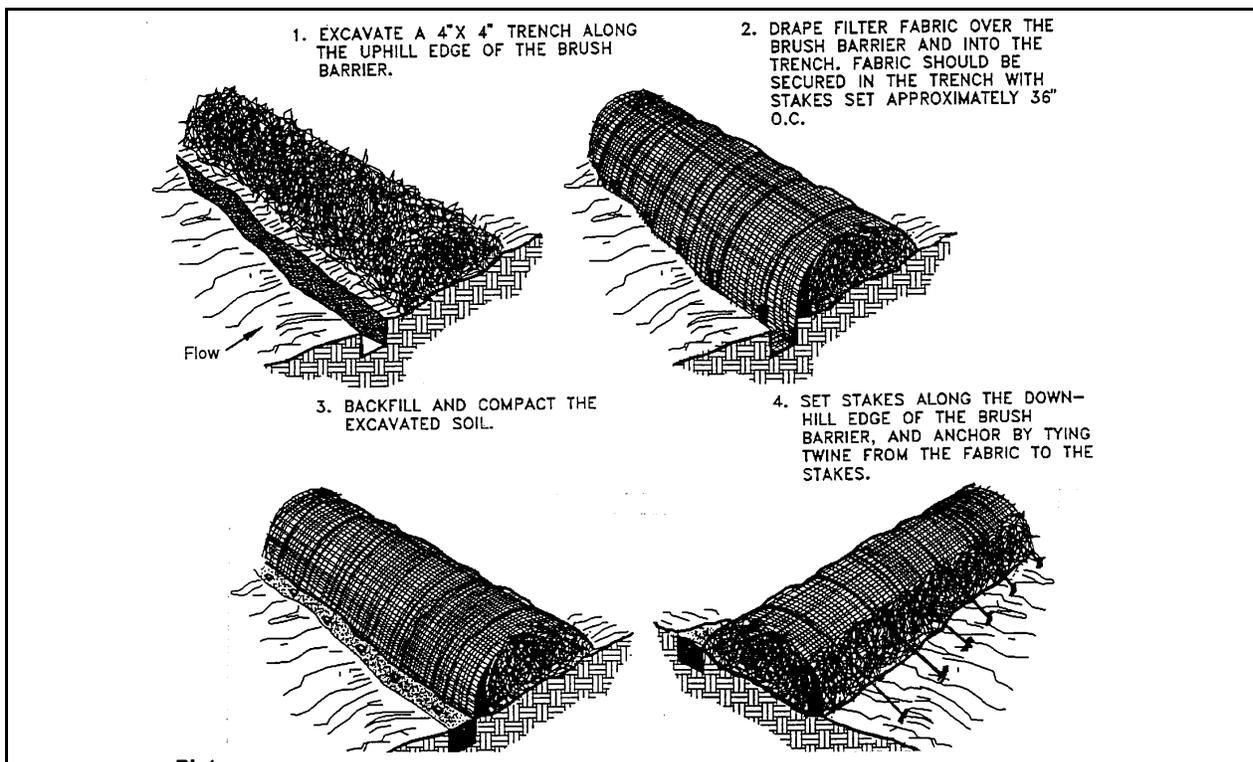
Construction of a Brush Barrier Covered with Filter Fabric
